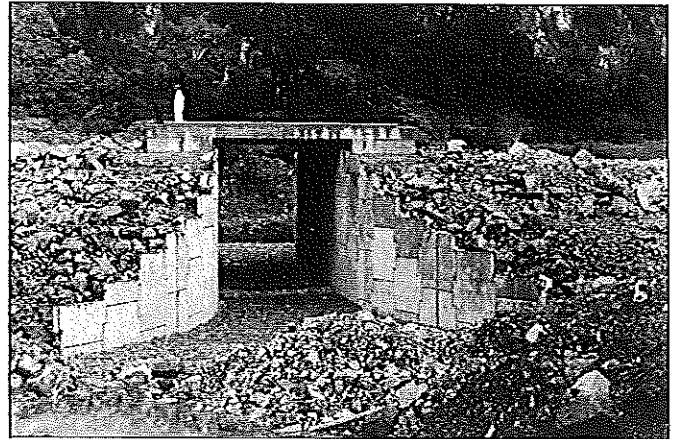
Photograph taken prior to placement of fill over the deck slabs
